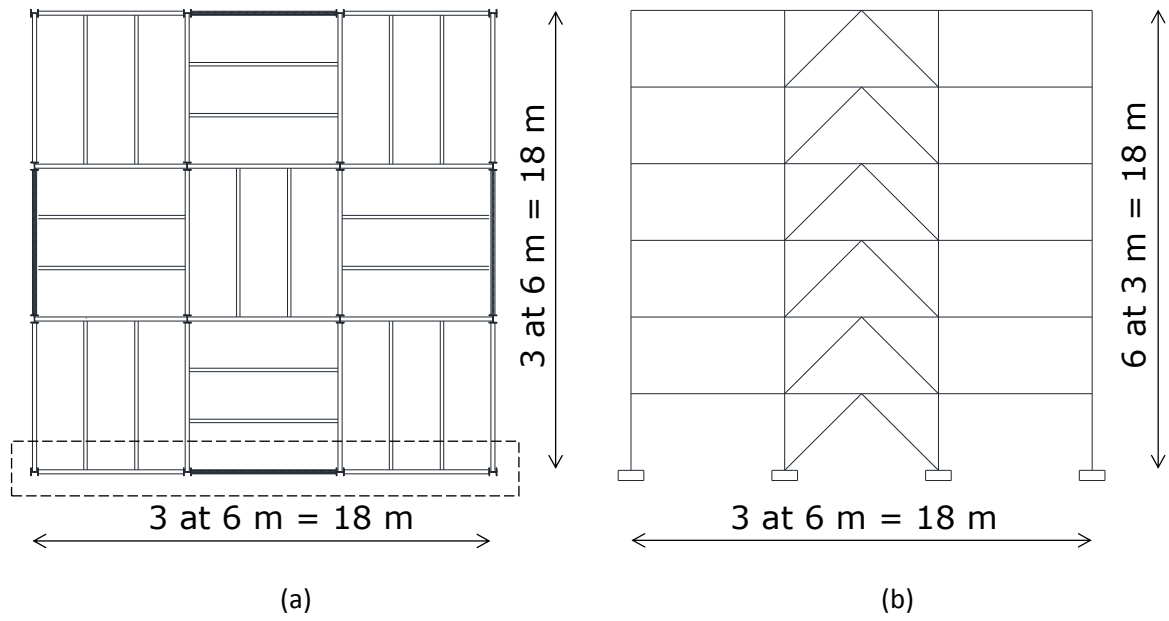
Prototype building: (a) plan view; and (b) elevation of a perimeter frame.
